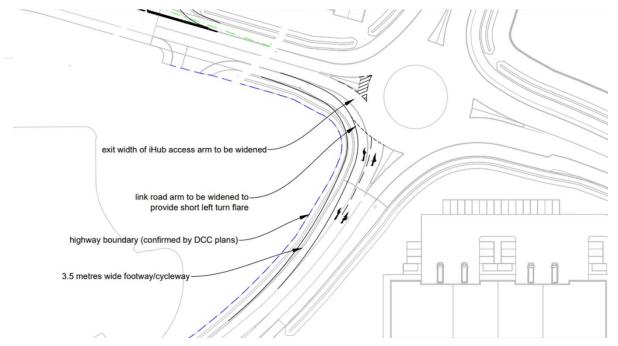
Proposed Flared Lane on Approach to I-Hub Junction.
